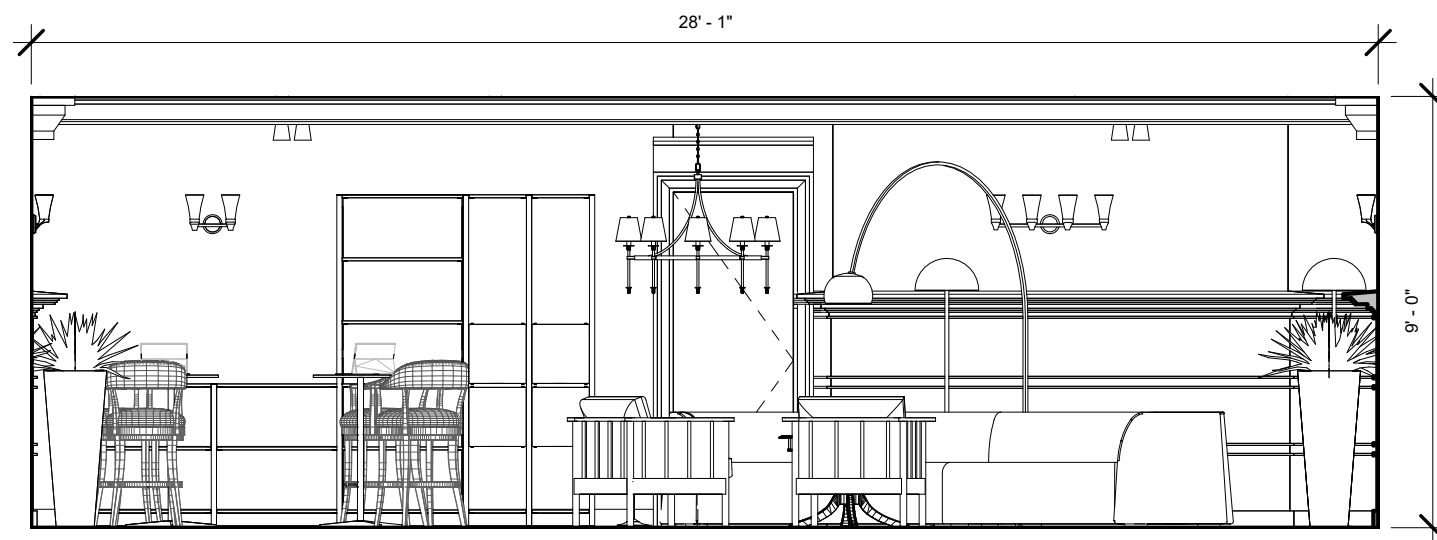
Image showing the Interior Elevation of a Section of Sitting in the Second Floor Lounge.
